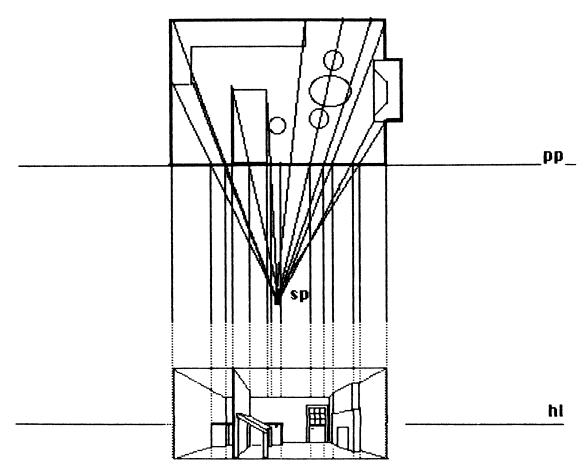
Interior wall and window lines added before enlarging the perspective.
